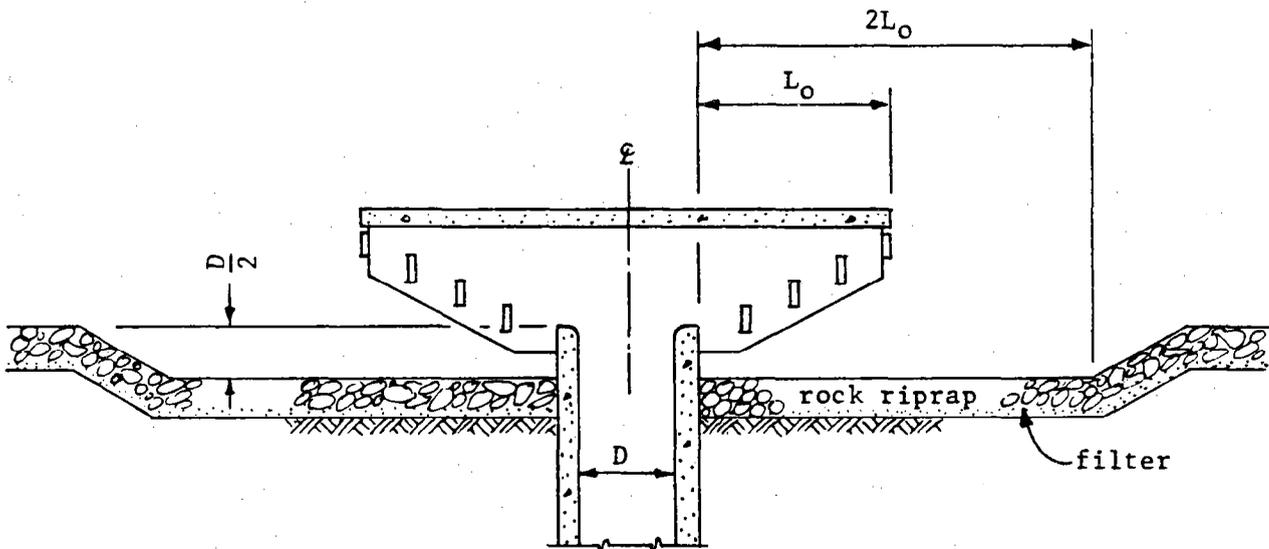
Longitudinal section along an embankment berm containing a baffle inlet riser
